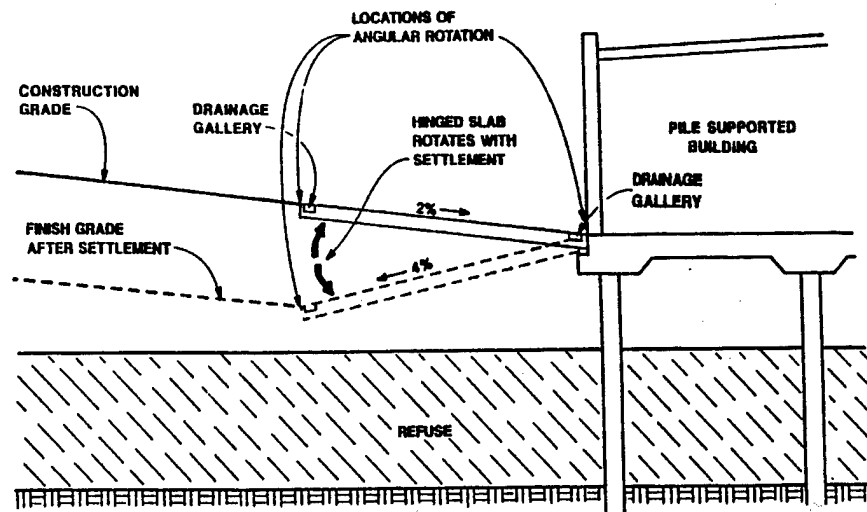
Hinged Slab at Building Entrance (Source: 42, p.178).
